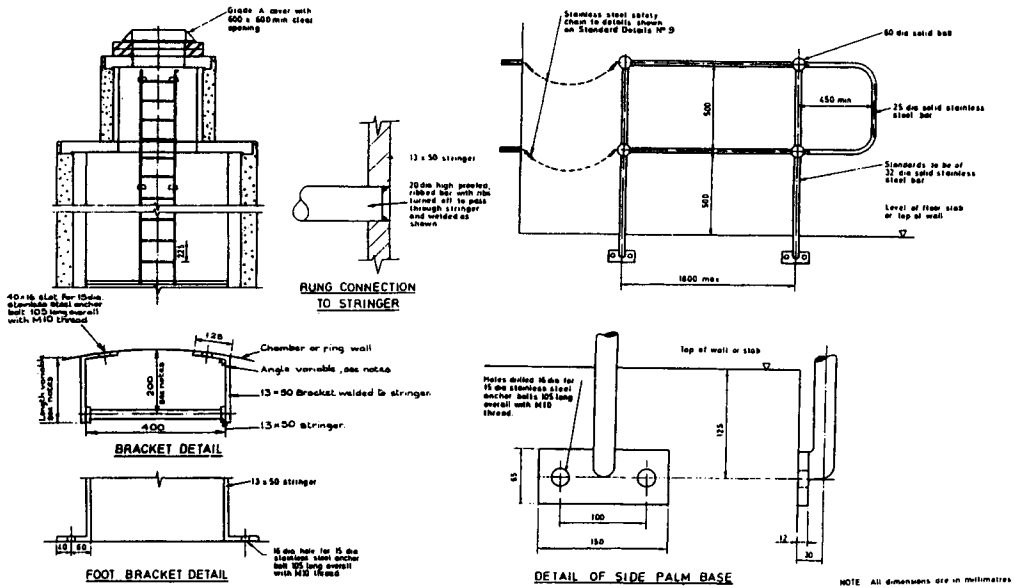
Standard detail for ladders and handrails (North West Water).
